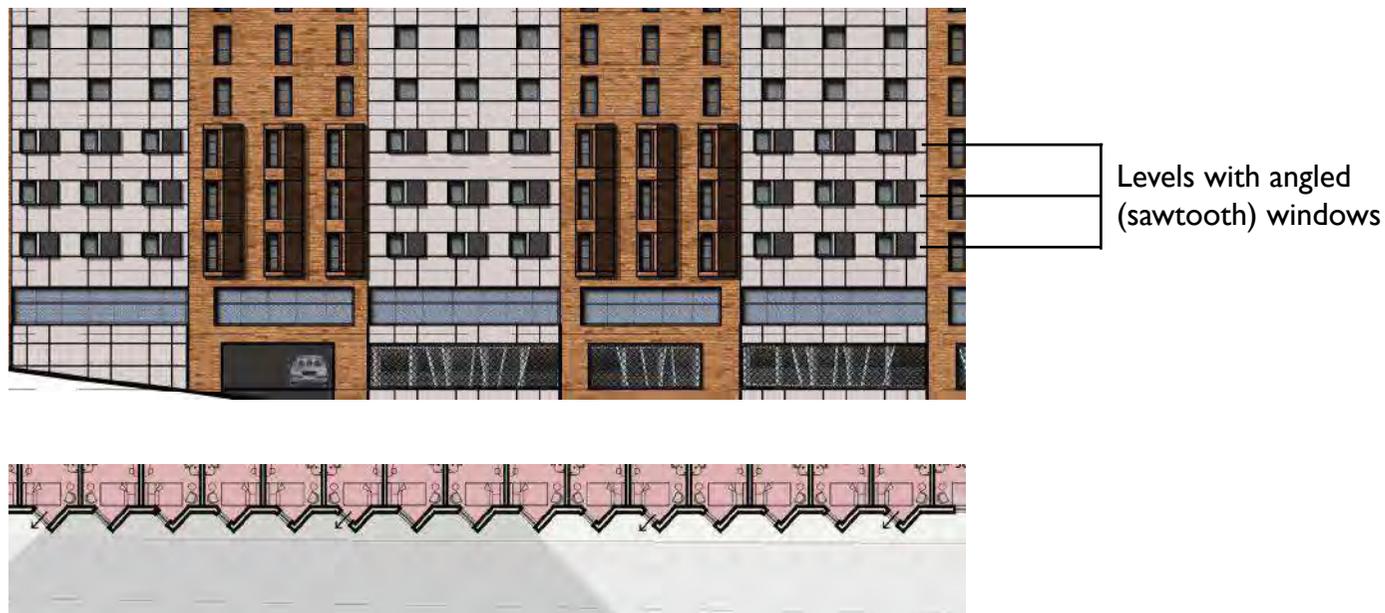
Selection of rendered west facing elevation and plan, showing the angled 'sawtooth' windows to avoid overlooking the opposite development.
